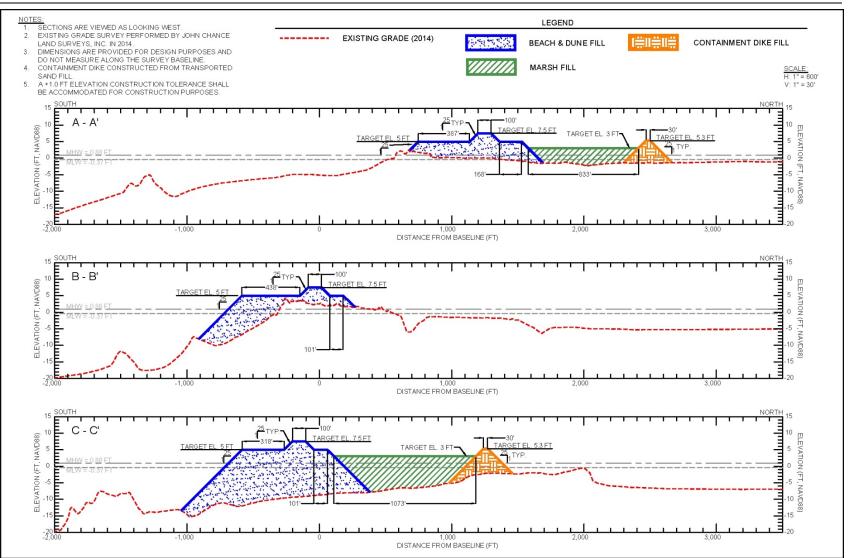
East Timbalier Island Restoration Typical Cross Section
